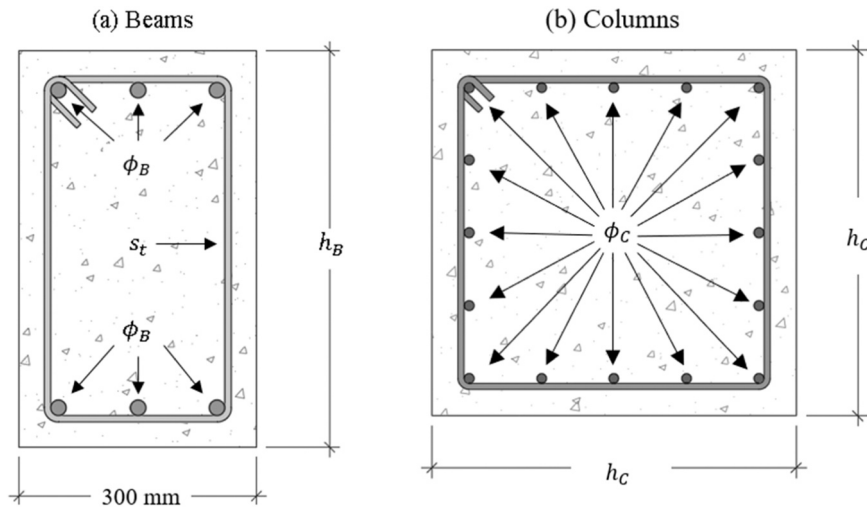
Adopted cross-section detailing of (a) beams and (b) columns.
